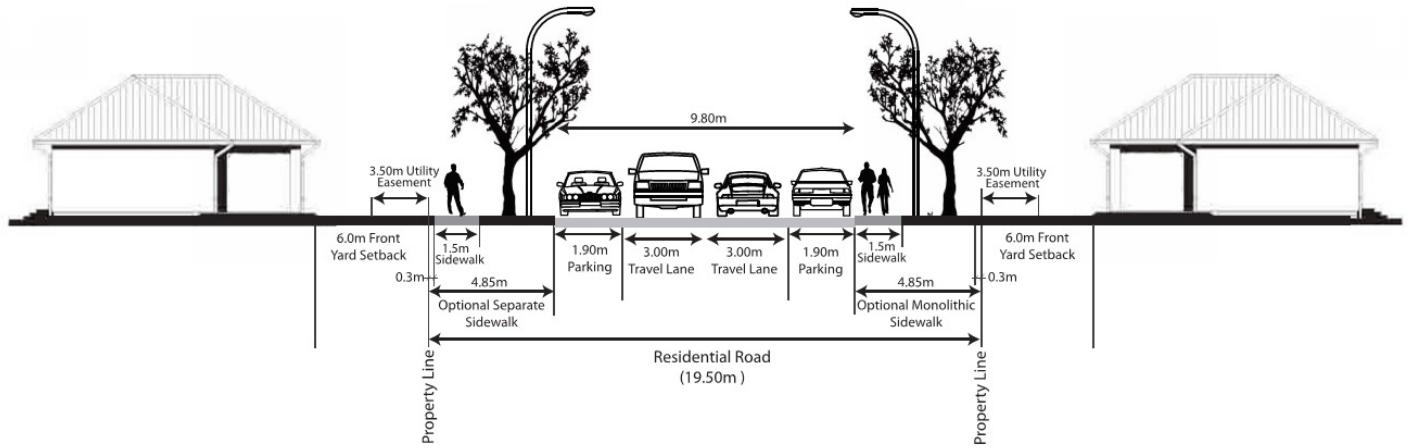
B: Residential Road – For Constrained Right of Way, or Cul-De-Sac
